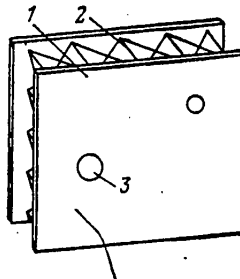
Reinforcing block with monolithic concrete faces.
